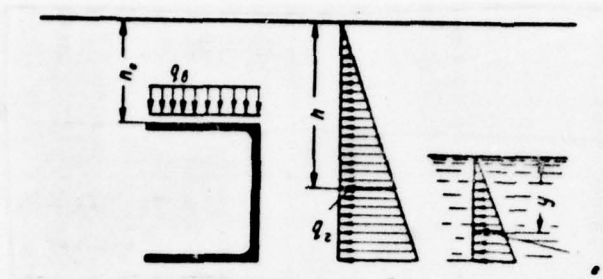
Load diagram on ground construction from soil and ground water.
